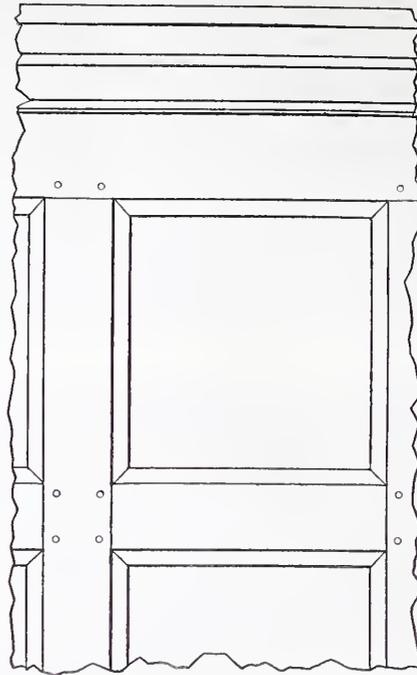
Detail of Wainscoting.—Scale, 1 1/2 Inch to the Foot.
